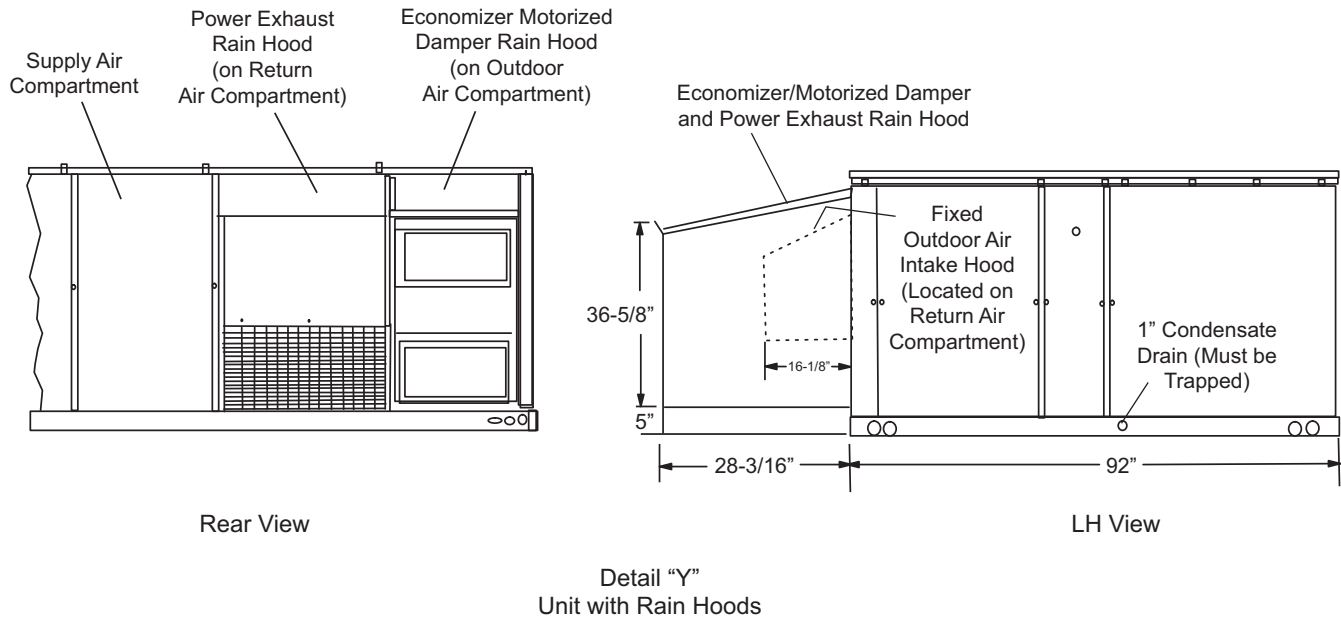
ZR180-300 Unit Dimensions Rain Hood
